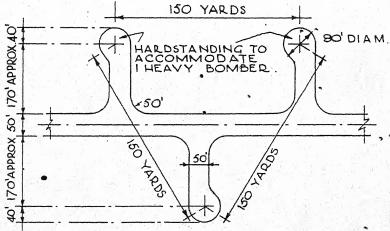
TYPICAL HARDSTANDING LAYOUT
